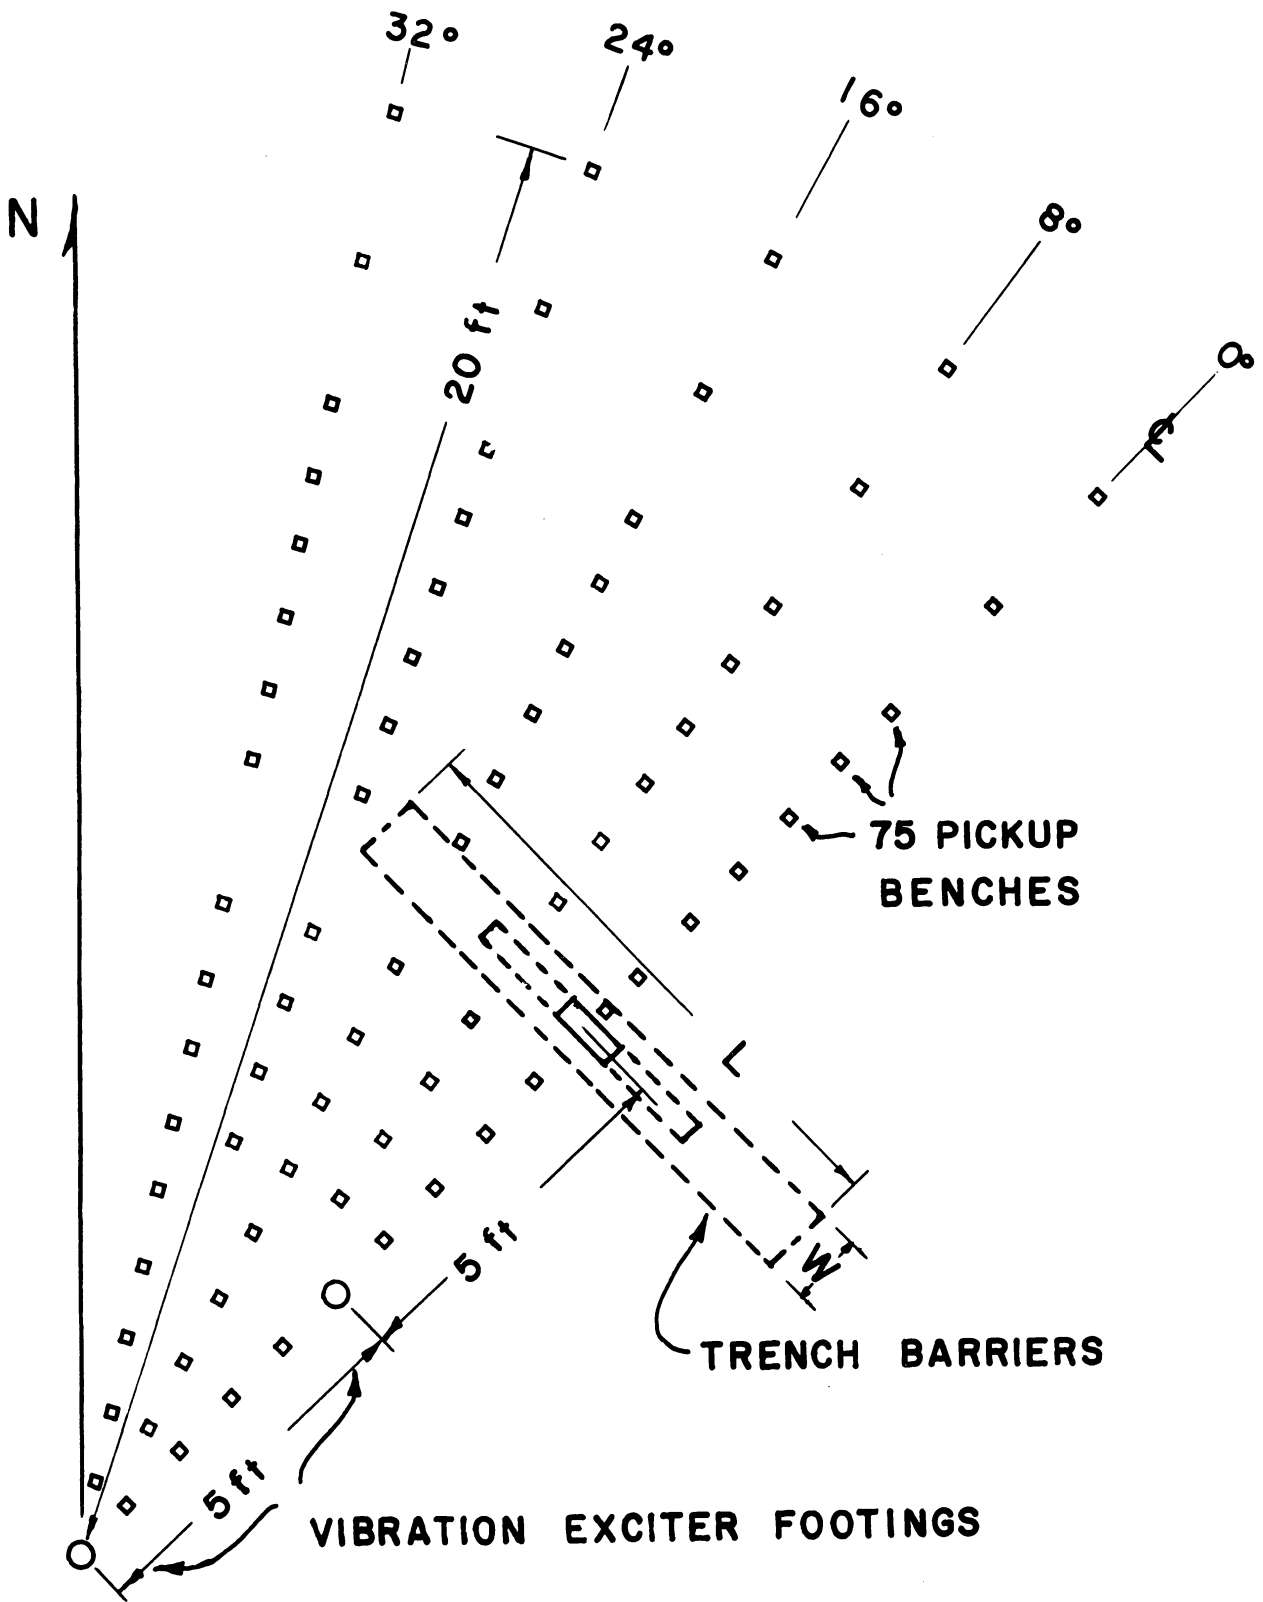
Plan View of Field Site Layout for Screening at a Distance.
